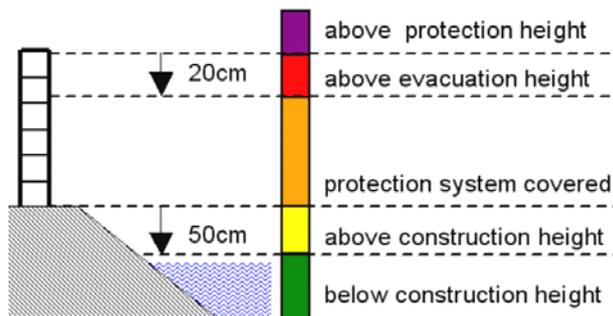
Schematic cross section of a flood protection system and its division of water levels into impacts (Øverland et. al., 2011)
